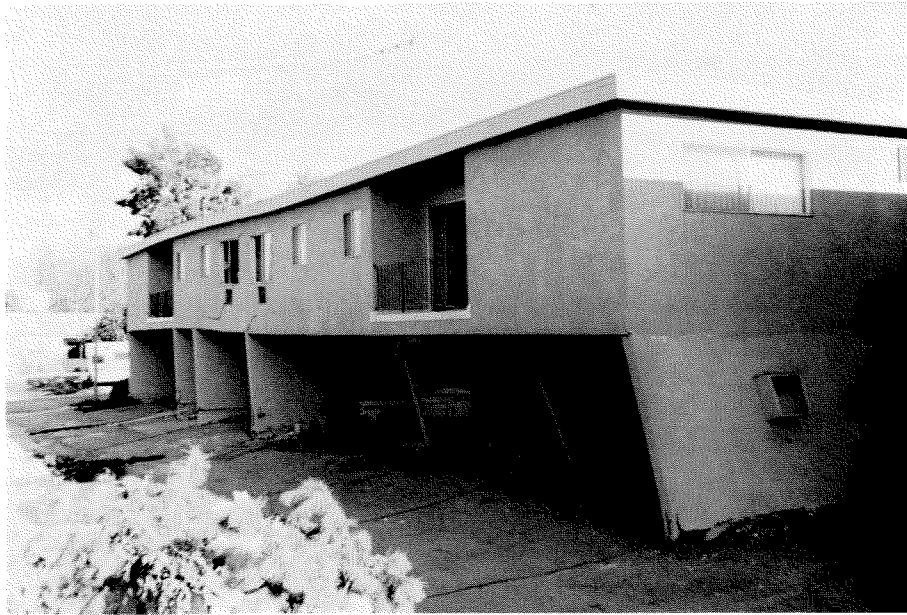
Rear wall northwest building. Mardette Apartments.
